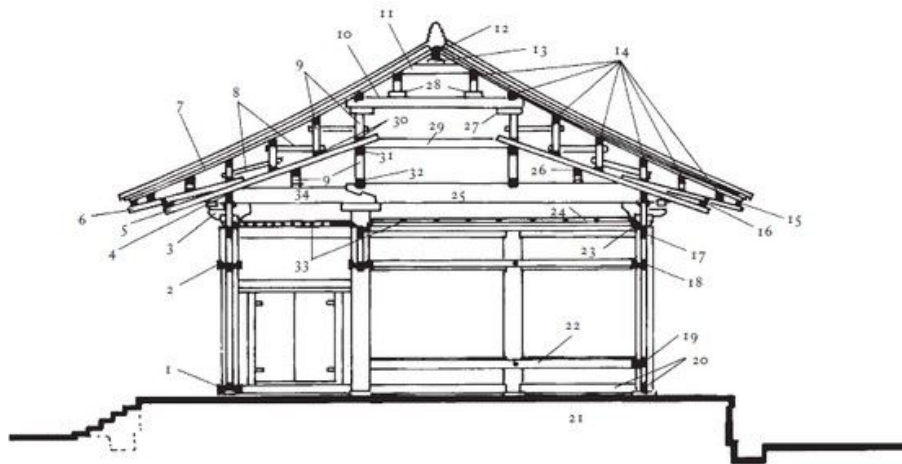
North-south section: 1. door sill; 2. mid-wall horizontal brace beam; 3. bracket complex; 4. wall purlin; 5. lower rafter; 6. upper rafter; 7. hidden rafters; 8. bridging; 9. stub posts; 10. mid-cross tie; 11. upper cross tie; 12. hidden ridge beam; 13. hidden ridge beam support block; 14. roof purlins; 15. eaves support; 16. upper rafter support; 17. head ties; 18. mid-wall penetrating tie beam; 19. waist tie beam; 20. base tie beam; 21. platform; 22. waist horizontal brace beam; 23. ceiling horizontal brace beam; 24. ceiling; 25. main beam; 26. outside longitudinal tie; 27. hidden support block; 28. post support block; 29. lower cross tie; 30. rafter hold-down beams; 31. upper longitudinal tie; 32. lower longitudinal tie; 33. ceiling lattice; 34. short main beam.
